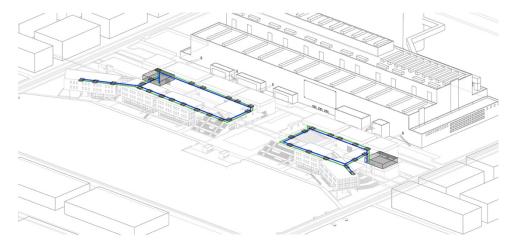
Building Systems – Structural Layout (Source: Author)
